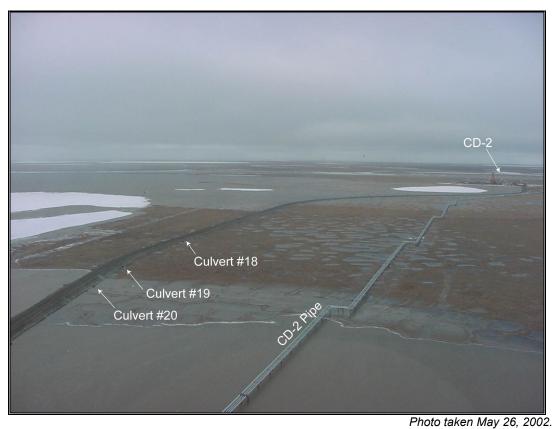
f Flooding conditions at Alpine looking west at CD-2.
